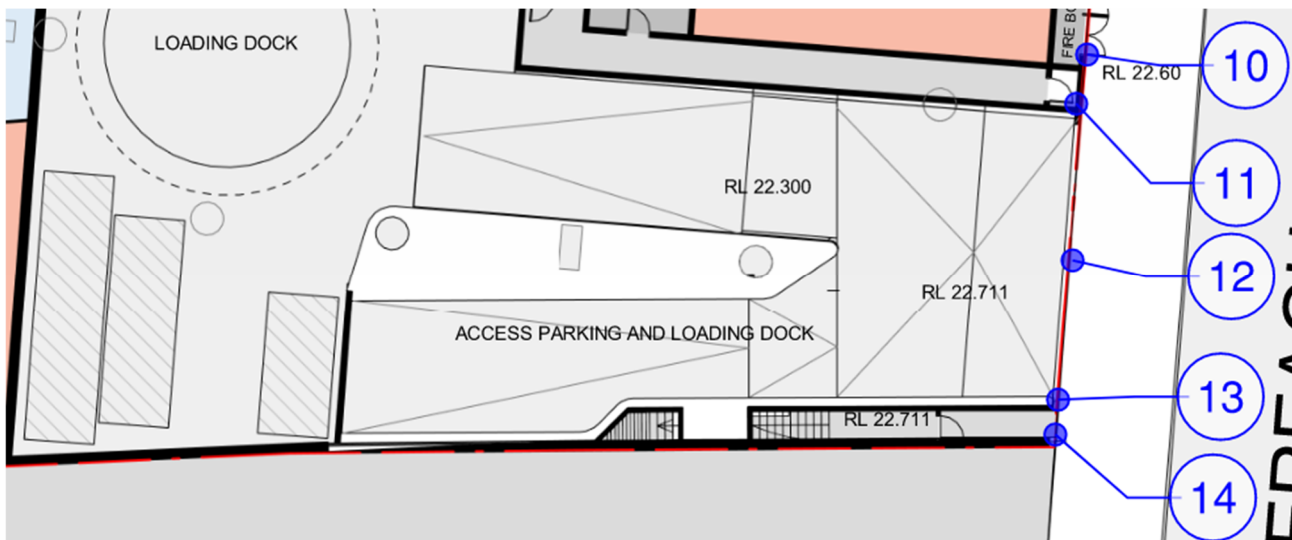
Proposed Loading Dock/Parking Entrance Ramp from Castlereagh Street - Plan (based on 3XN, SK-11-100, Issue 4, 14/07/2025)
